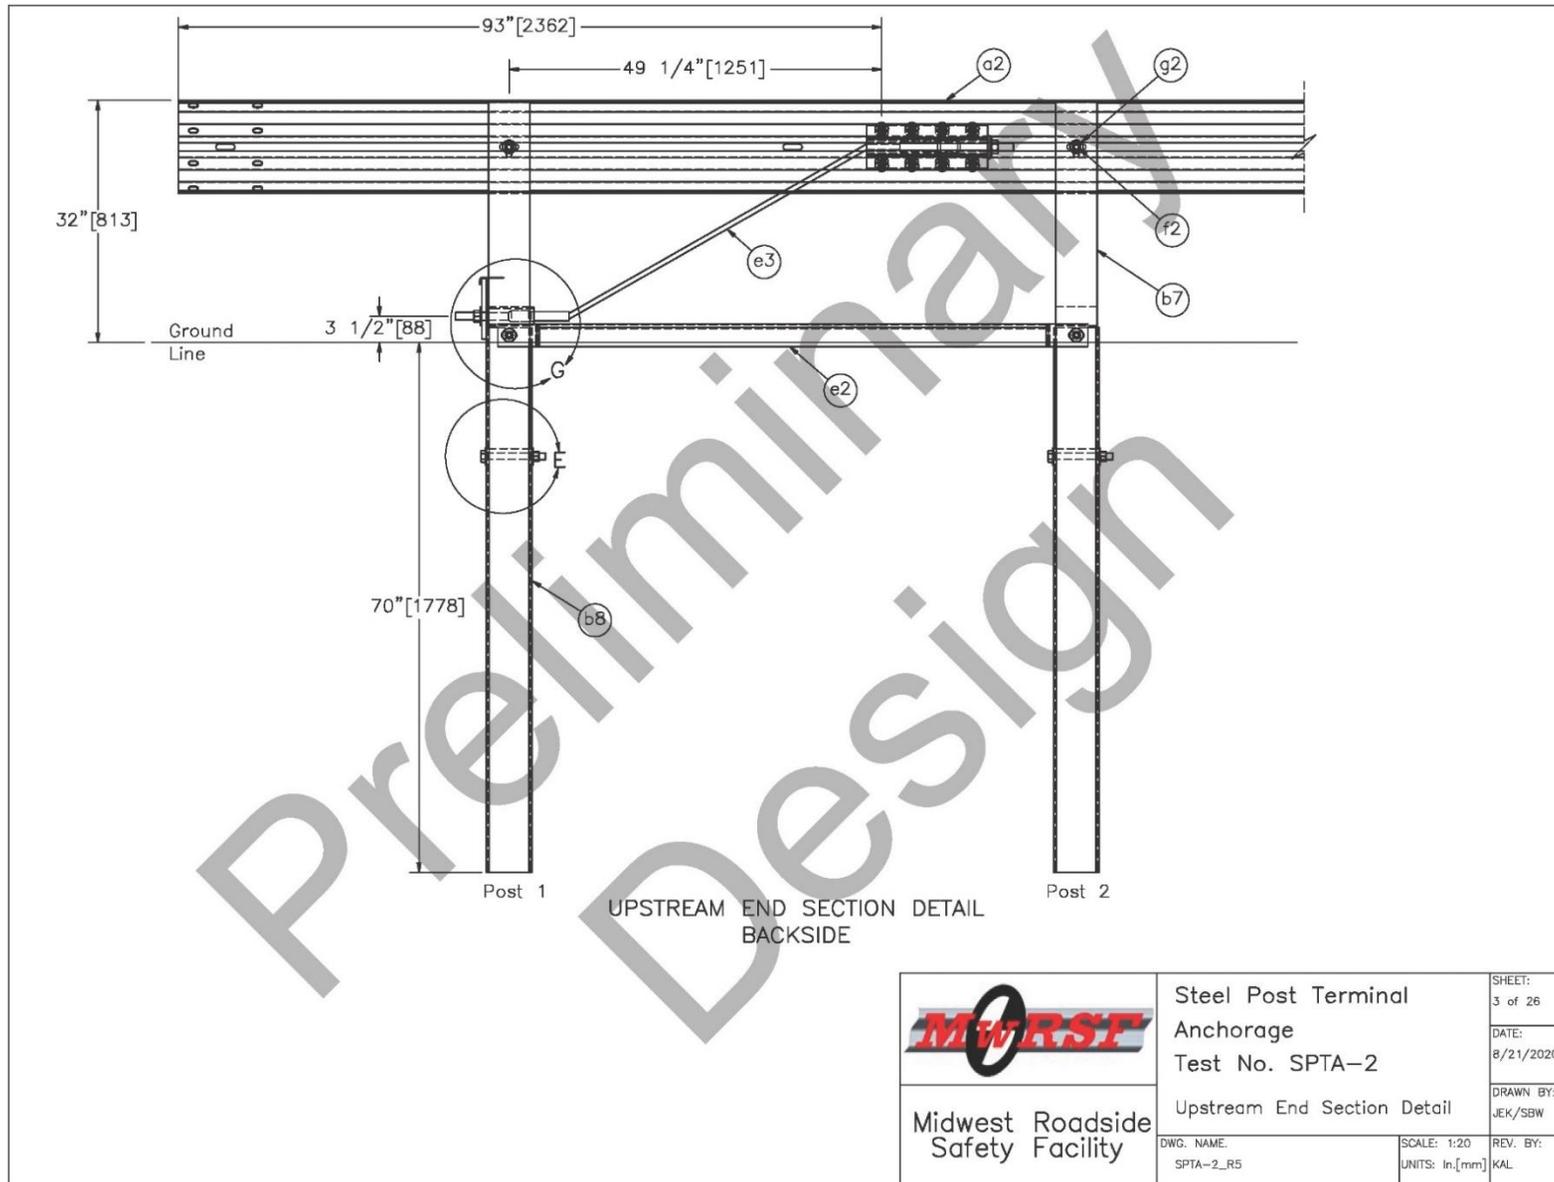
Upstream End Section Detail, Test No. SPTA-2
